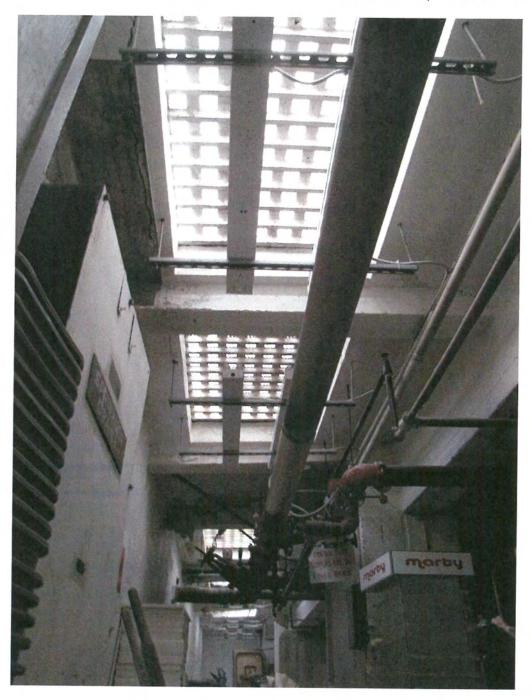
View looking up at the vault lights along the western wall of the basement level.
